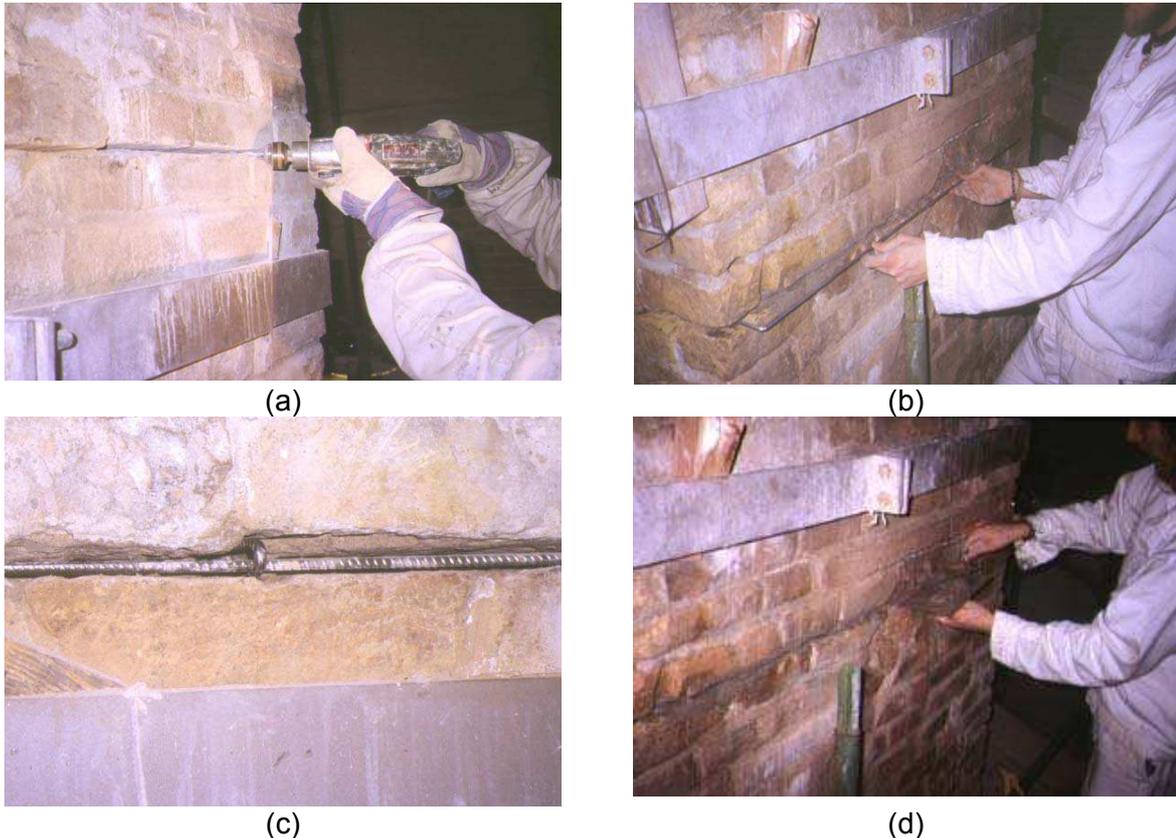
steps for reinforced repointing intervention (Valluzzi, Binda, Modena, 2004)
